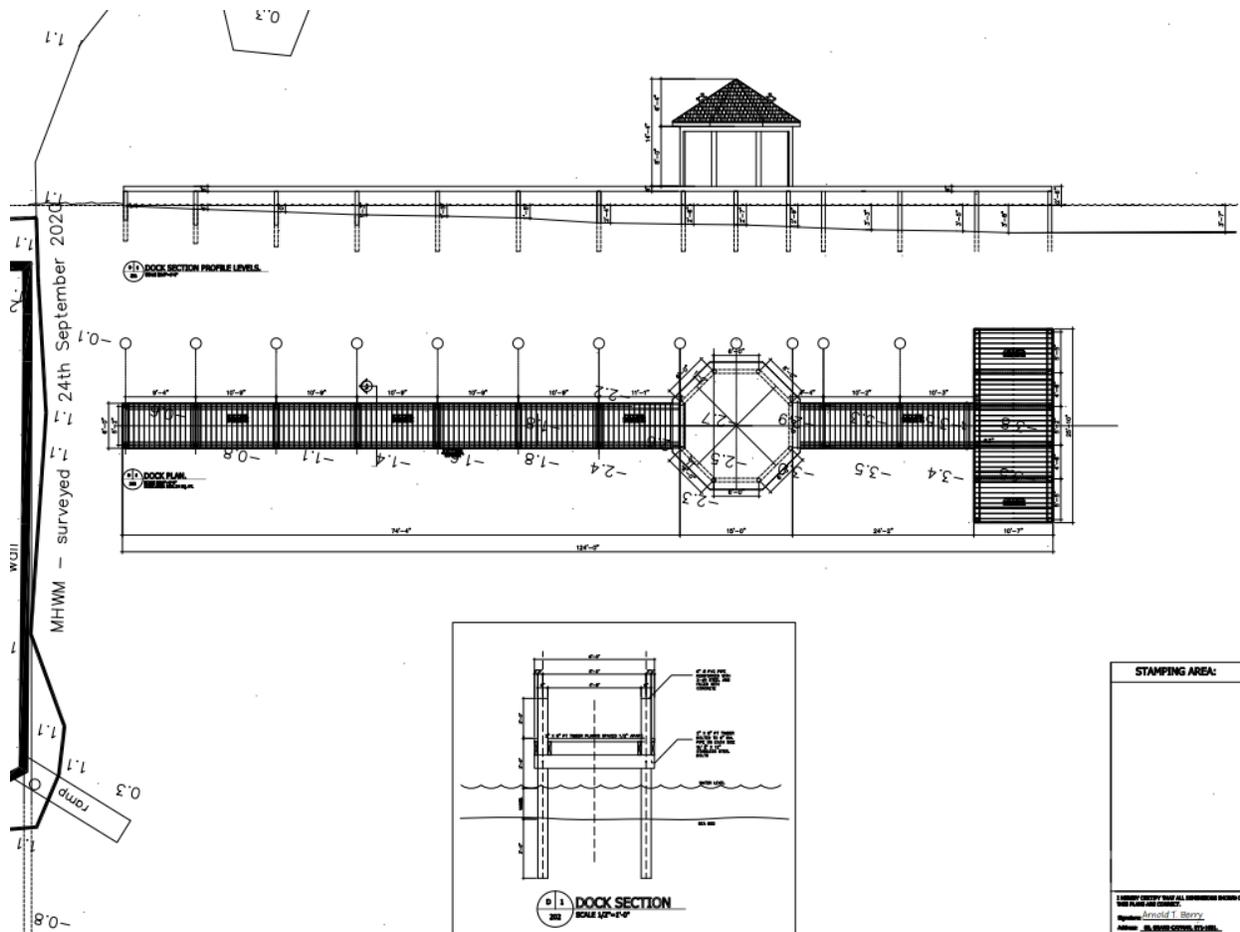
PLAN EXTRACT SHOWING DIMENSIONS OF THE PROPOSED DOCK (ISLAND DRAFTING 15 MARCH 2021)
